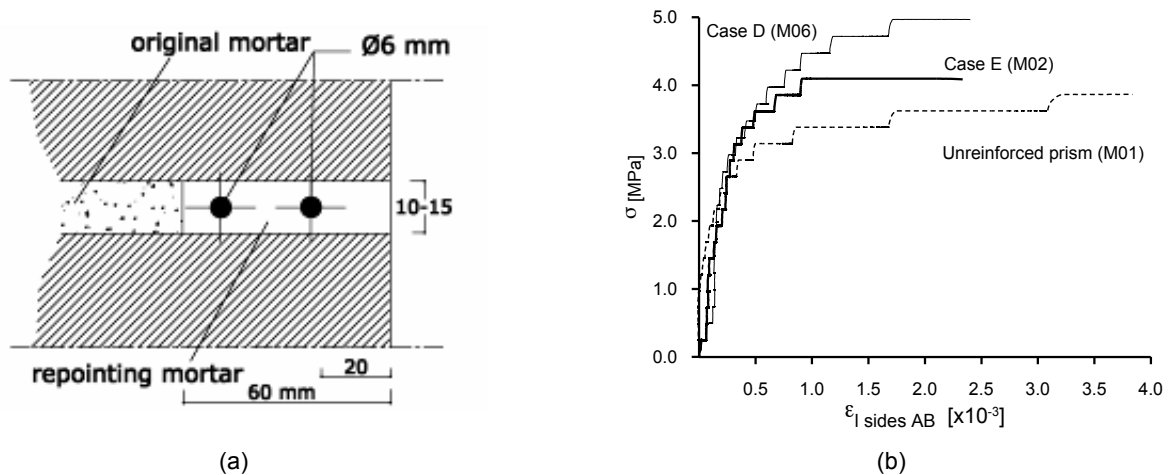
General scheme of the reinforcement technique with steel bars and horizontal deformation measured on two sides of the wallettes reinforced with steel bars.
